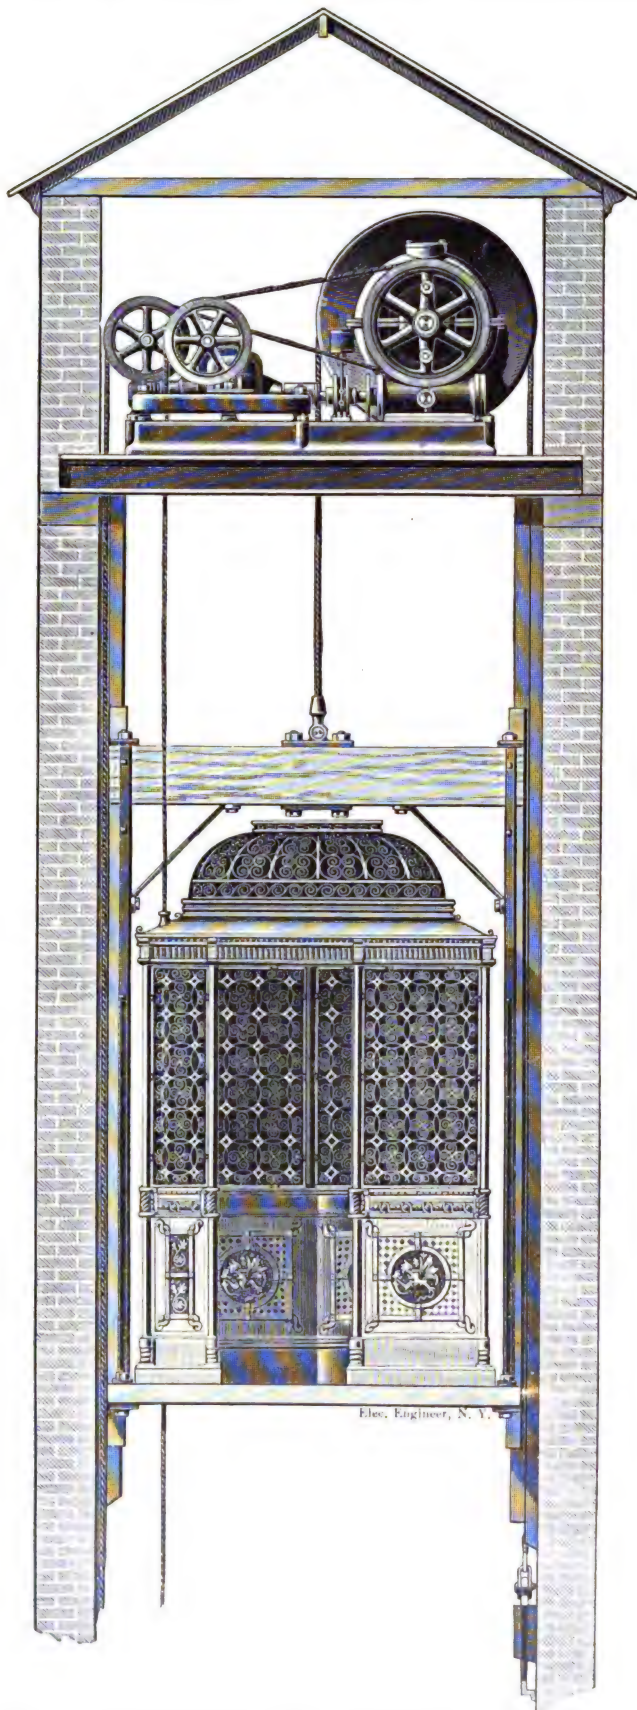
"AMERICAN" ELECTRIC ELEVATOR—MOTOR AT TOP OF SHAFT.
